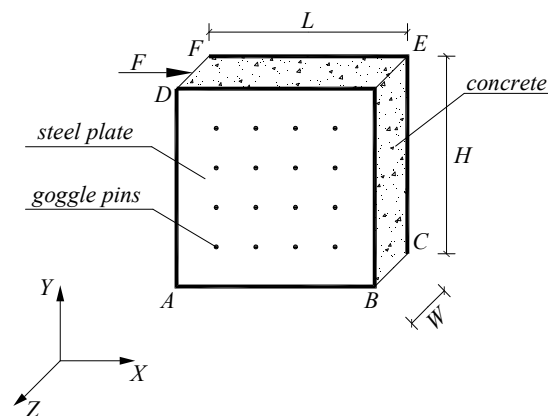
Application of load and correlative parameters of twin steel plates-concrete composite shear wall
